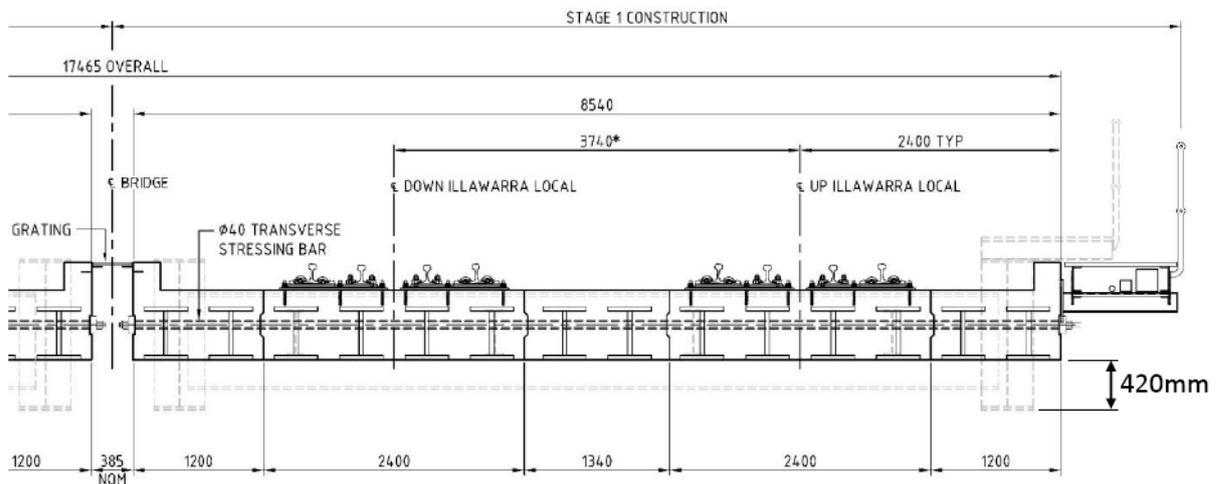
Substitution of old riveted railway bridge with 13,1m span (dashed) with prestressed in transversal direction superstructure of imbedded steel profiles (filler beam)
